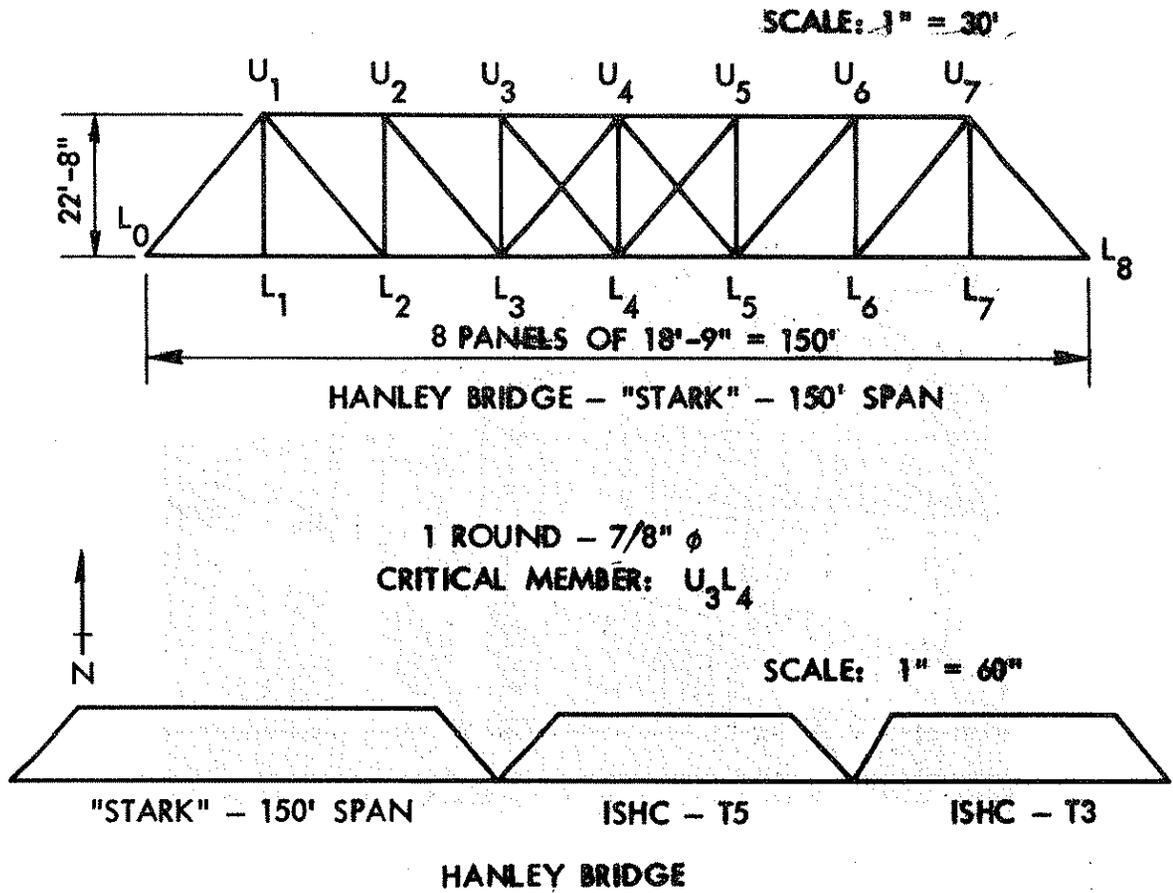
Details of Hanley Bridge (Polk County) - "Stark" 150-ft span.
